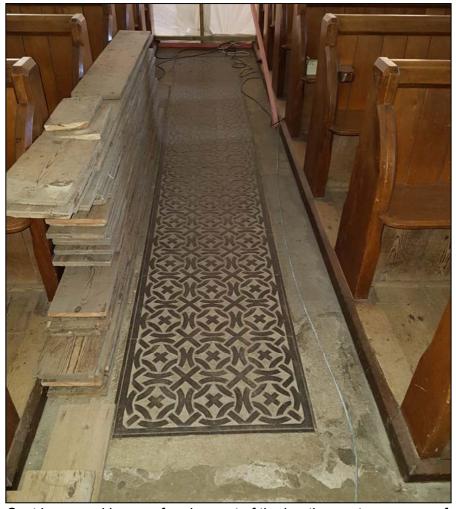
Cast iron panel in nave forming part of the heating system, camera facing west
